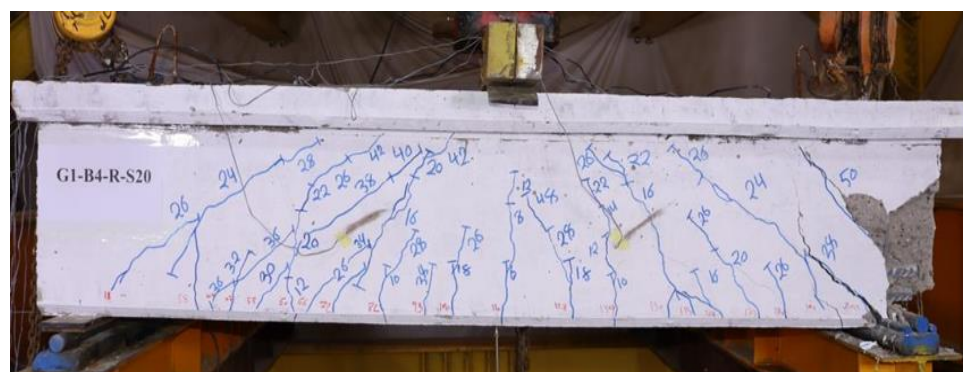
Failure crack pattern of specimen G1-B4-R-S20
